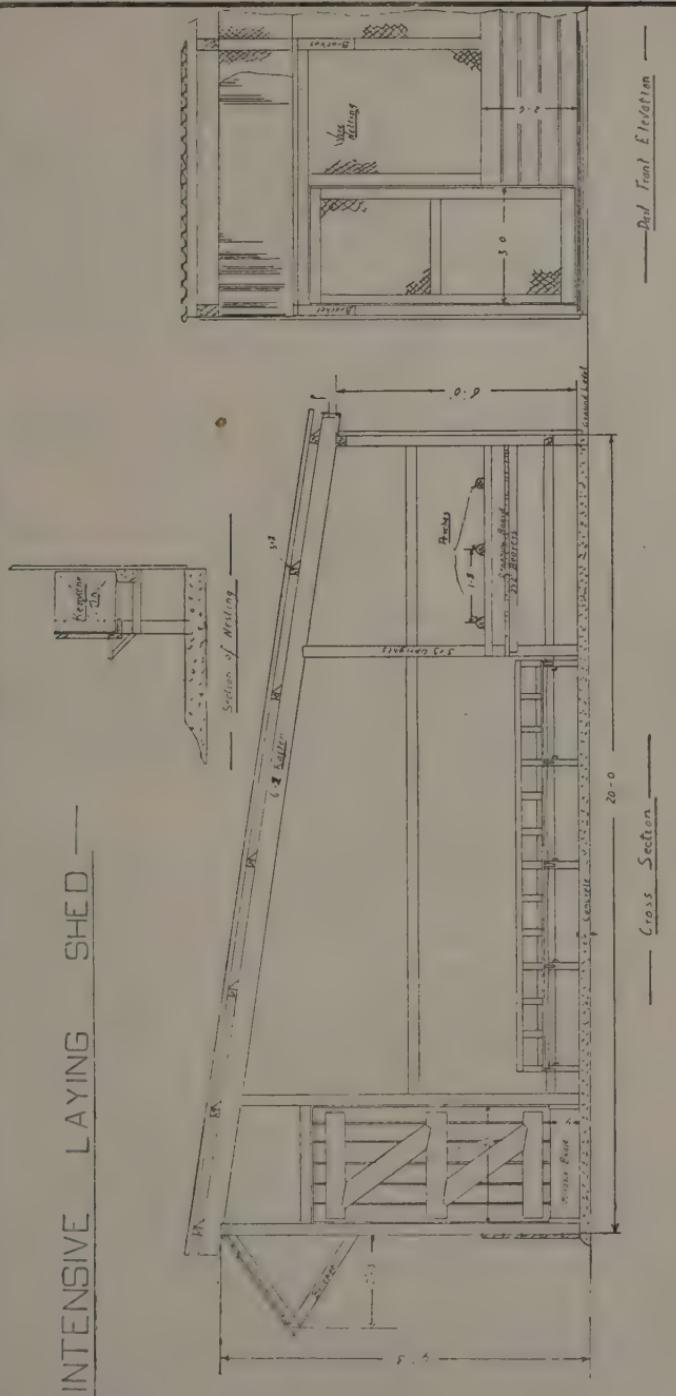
SHOWING END SECTION AND PART FRONT ELEVATION OF INTENSIVE LAYING SHED.
